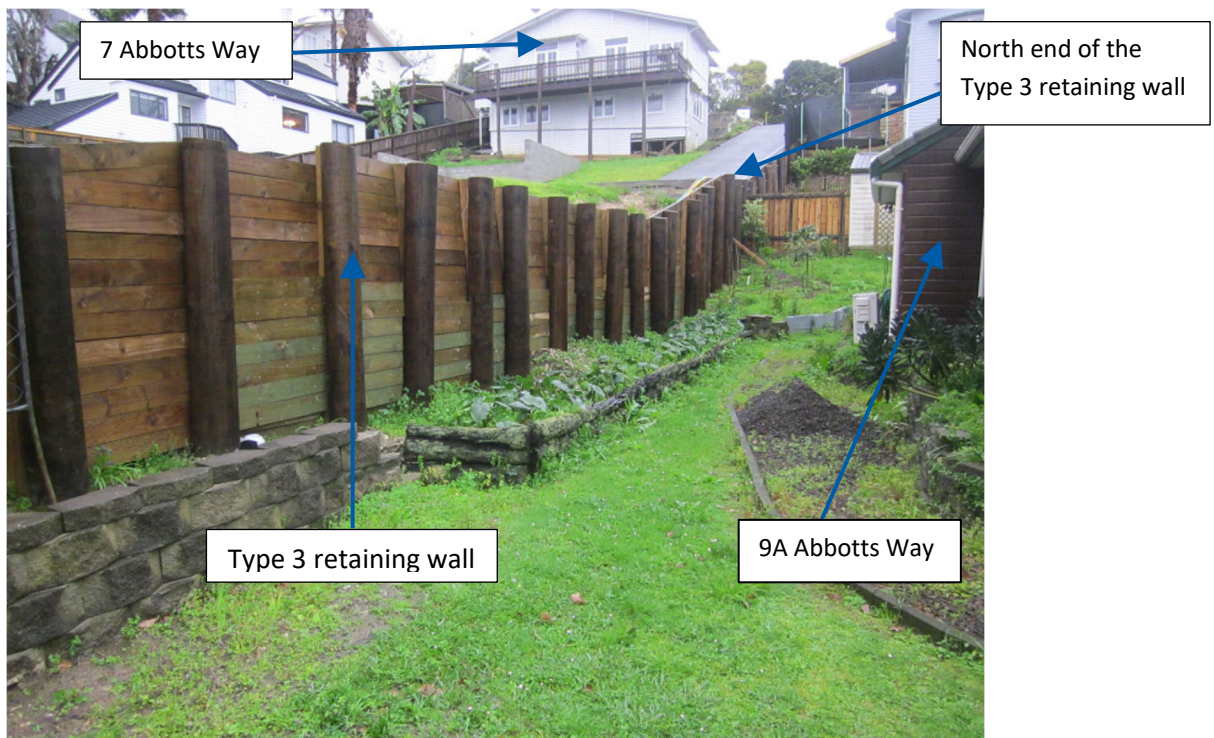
7 and 9A Abbotts Way, and the Type 3 retaining wall.¹⁴
